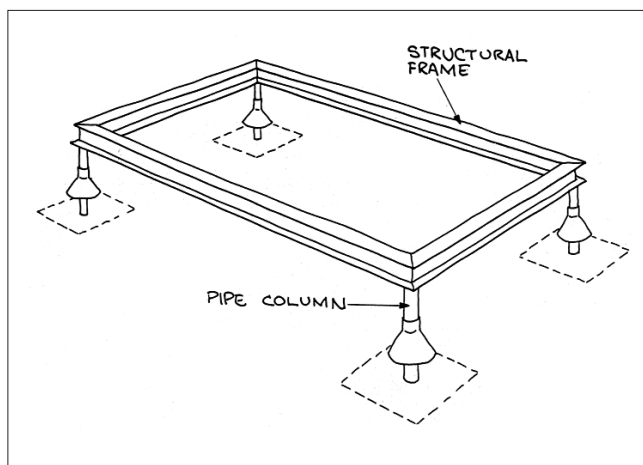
The NRCA recommends a stand be used to mount roof-top equipment. The stand allows roofers to make repairs and reroof without having to extend ductwork later on.
